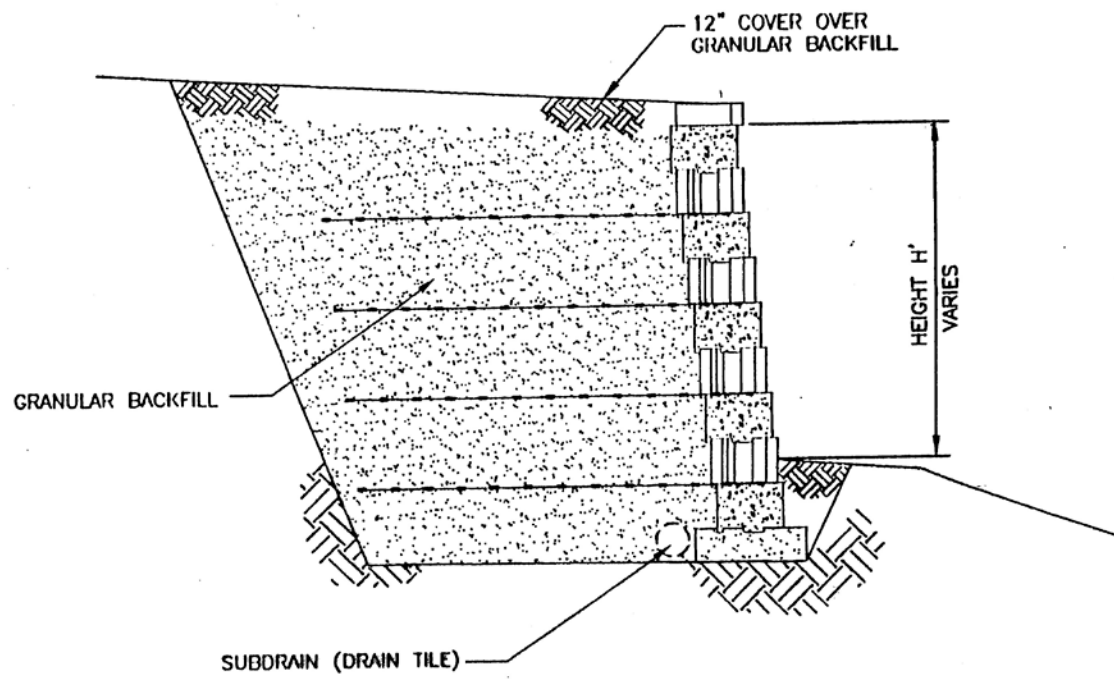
MSE Segmental (Modular) Wall Section
